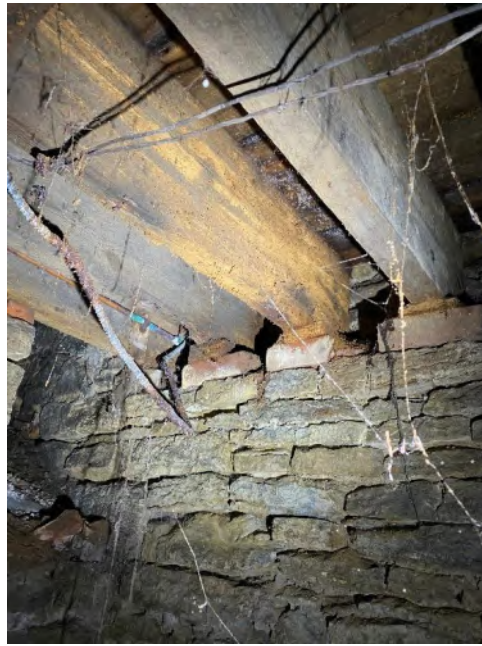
Center Foundation Wall Joist Erosion Measurement
